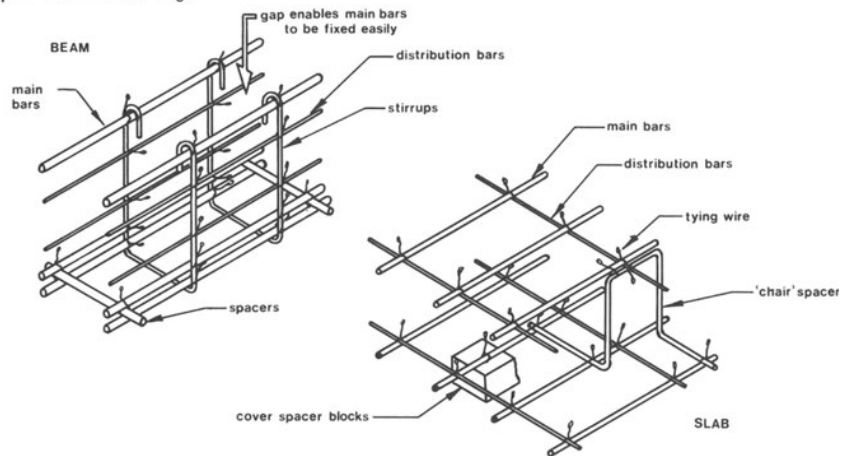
Links, stirrups, chairs and spacer bars. (The terms 'links' and 'stirrups' are now more commonly called 'column links' and 'beam links' respectively)
